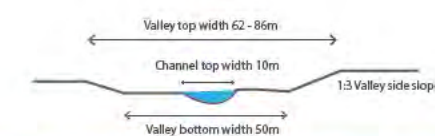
3: Proposed River Diversion Cross - Sections
